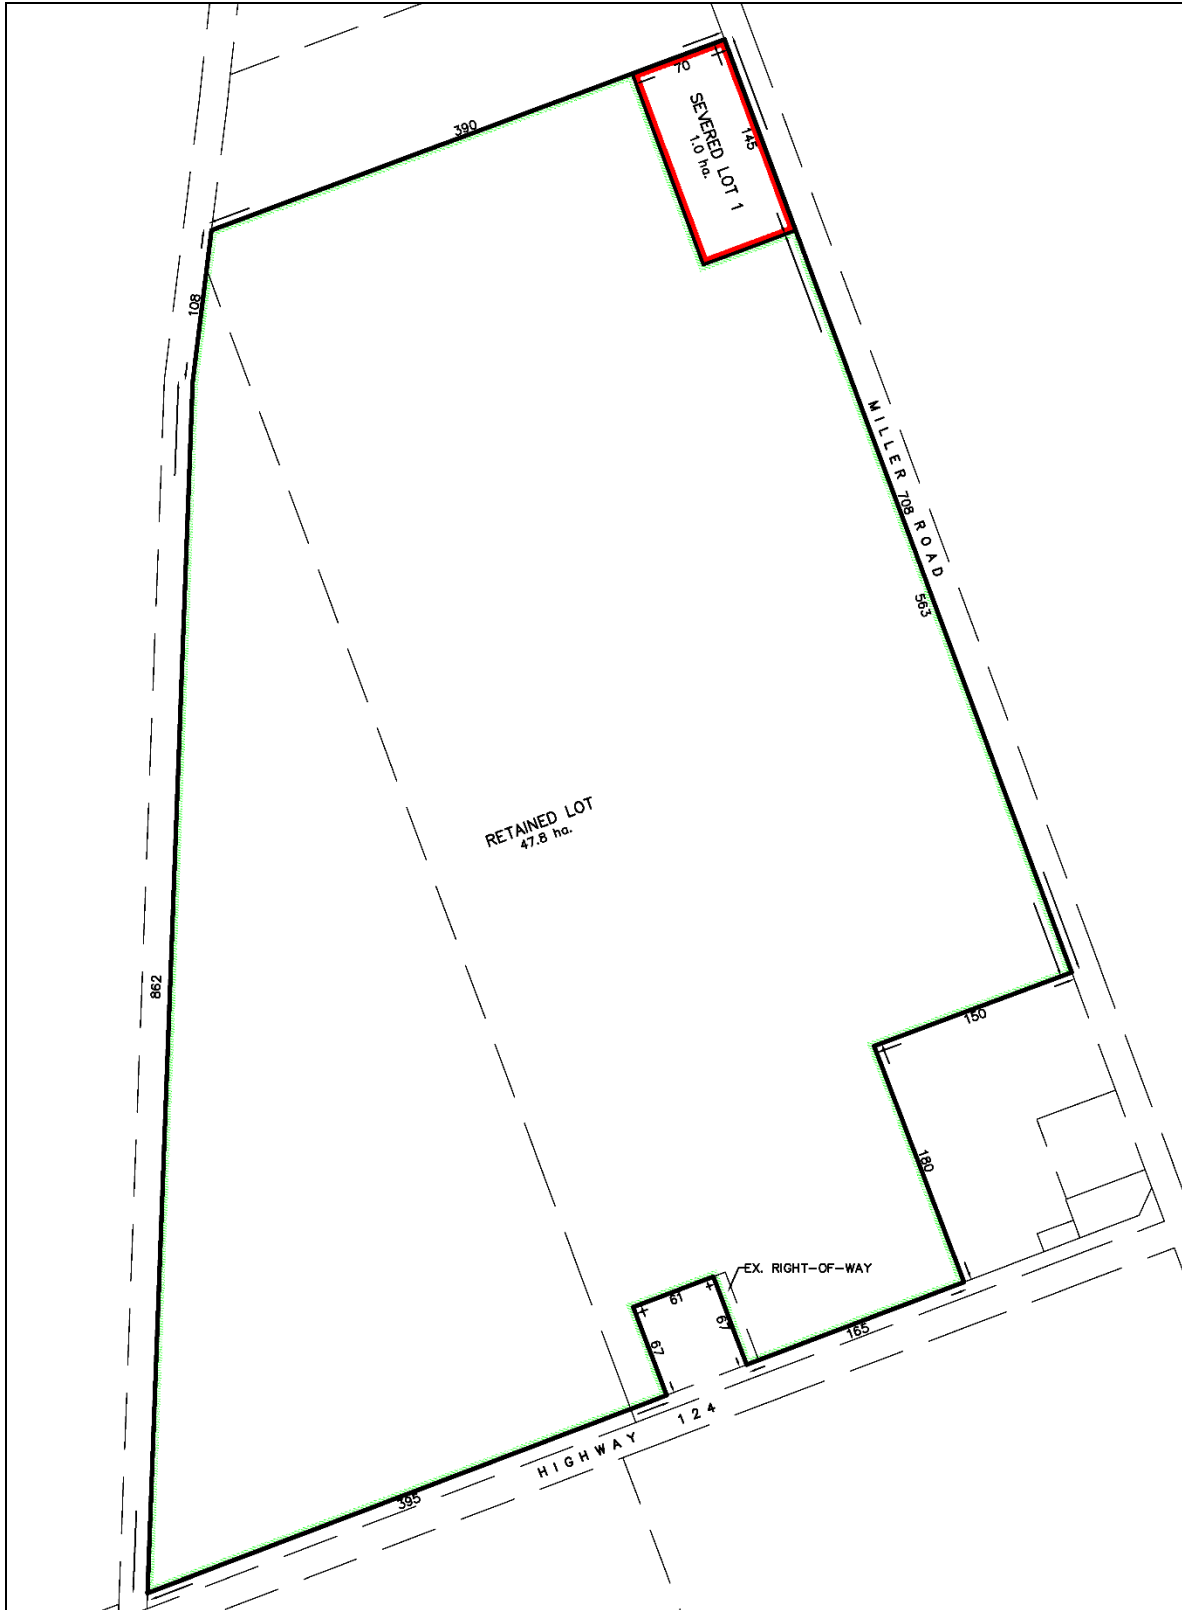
Proposed Lot Configuration (Plan Muskoka)
